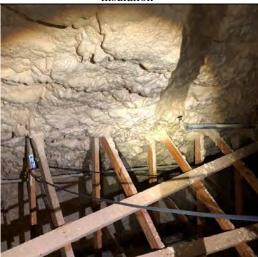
Clubhouse wood roof trusses and pipe hanger
